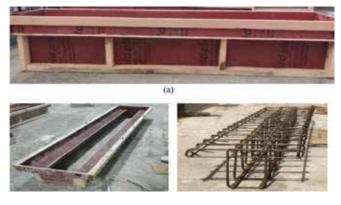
(a)(b) Formwork of T-Beam, (c) Reinforcement cage of T-Beam
